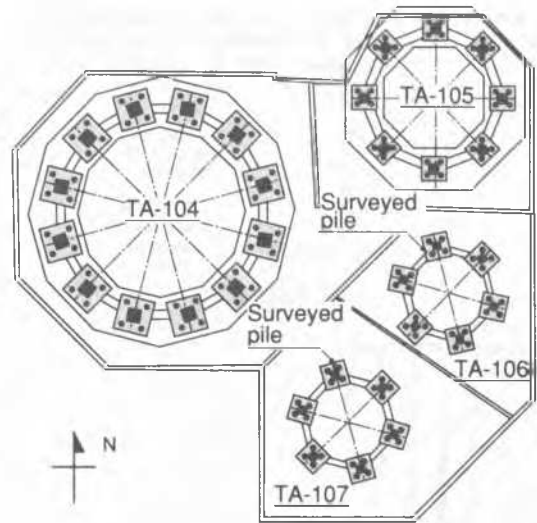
Plan view of the foundations for the spherical tanks 104, 105, 106 and 107
